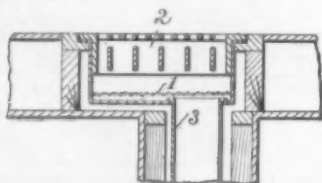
shows a cross section of the heating pipe, inside the furnace. It consists of a short piece (say 2 inches) of extra heavy black pipe, threaded at each end to receive reducing caps, which connect with the pipe line. Inside this pipe is another, $1\frac{1}{2}$ inches in diameter, which leaves only a small space for the water to circulate in; that is to say, the water is spread out in a very thin sheet, which very easily heats. Three small sections on top and bottom of this pipe, about $\frac{1}{4}$ inch wide, are turned outward, so as to fit the inside diameter of the outside pipe, and thereby keep it central. Outside the furnace is placed a faucet or stop-cock, so that the sediment may be drawn off, which should be done at least once a week.
